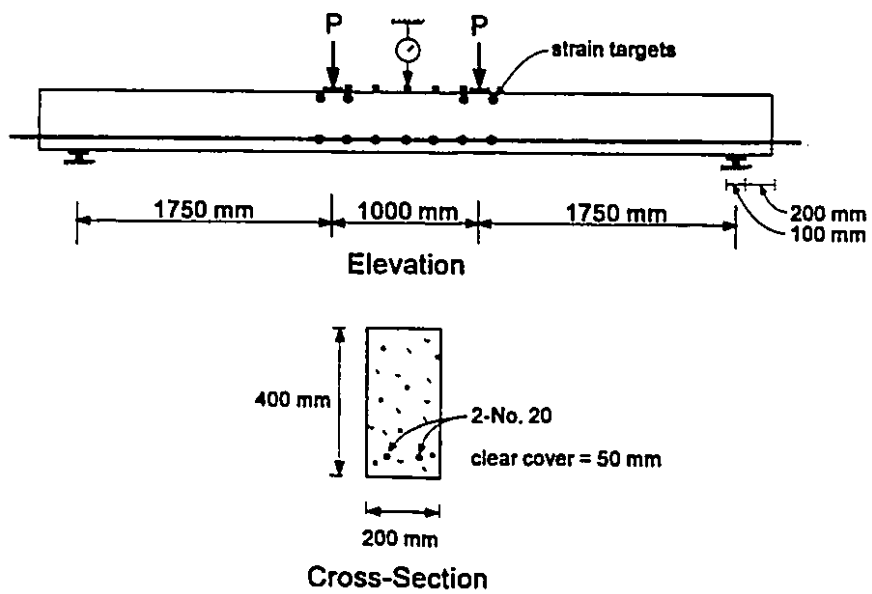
Geometry and Reinforcement Details of Beam HUCB (Abrishami et al., 1995)
